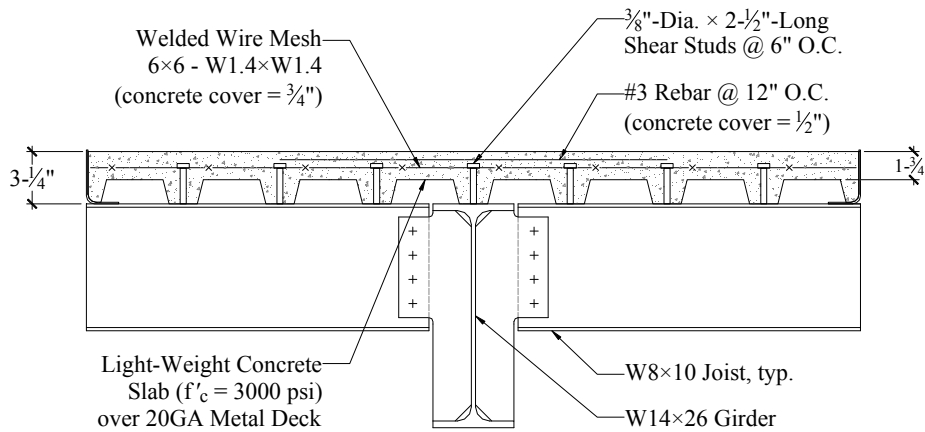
Cross section of composite floor slab of Physical Sub-Structure #1
